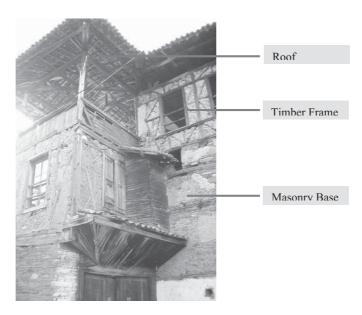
Sections of a timber-framed Anatolian house, an example from Birgi.
